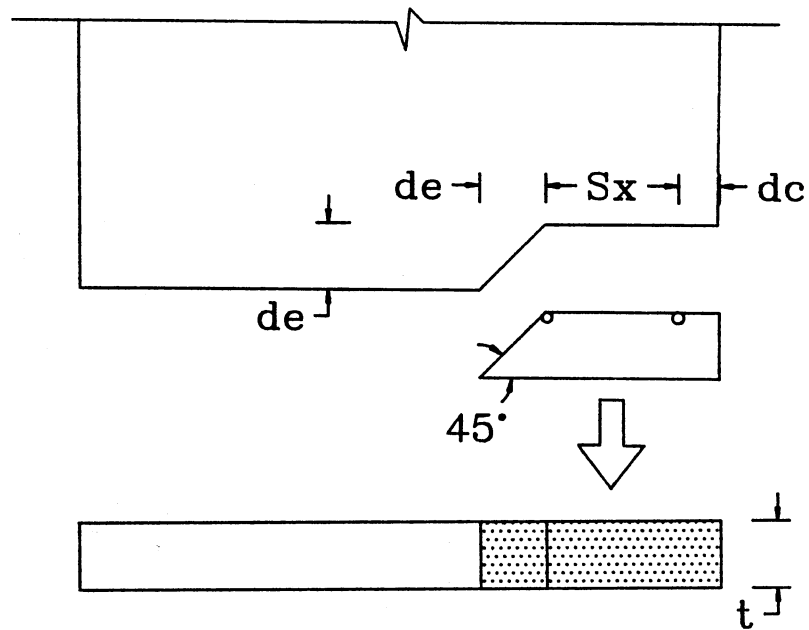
Failure Surface for Type II Specimens Embedded in "Thin" Slabs
